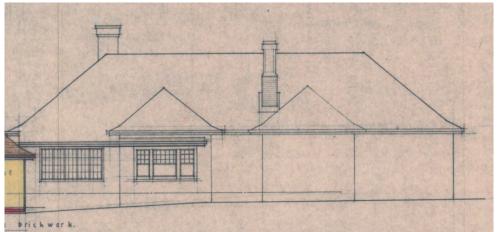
West elevation, facing Griffiths Grove, in 1987, showing separate roofs above bay windows and a chimney on this elevation. (Source: BP 2395/1987)
